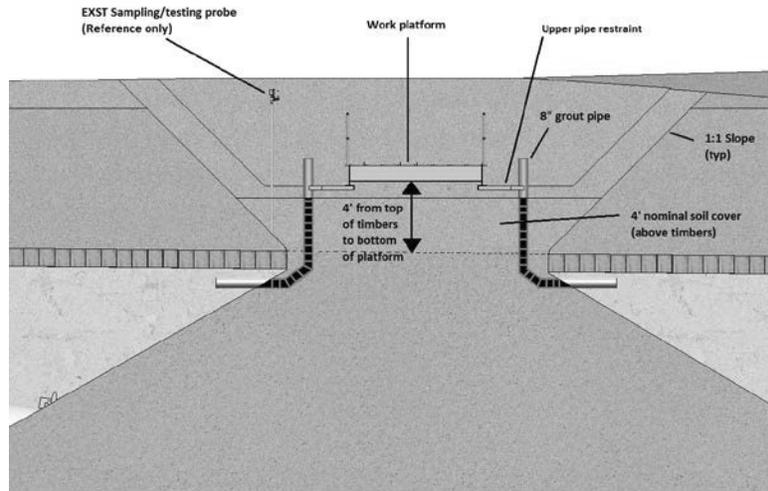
Conceptual Profile of Grouting Connections at Tunnel 1 Collapse Location
